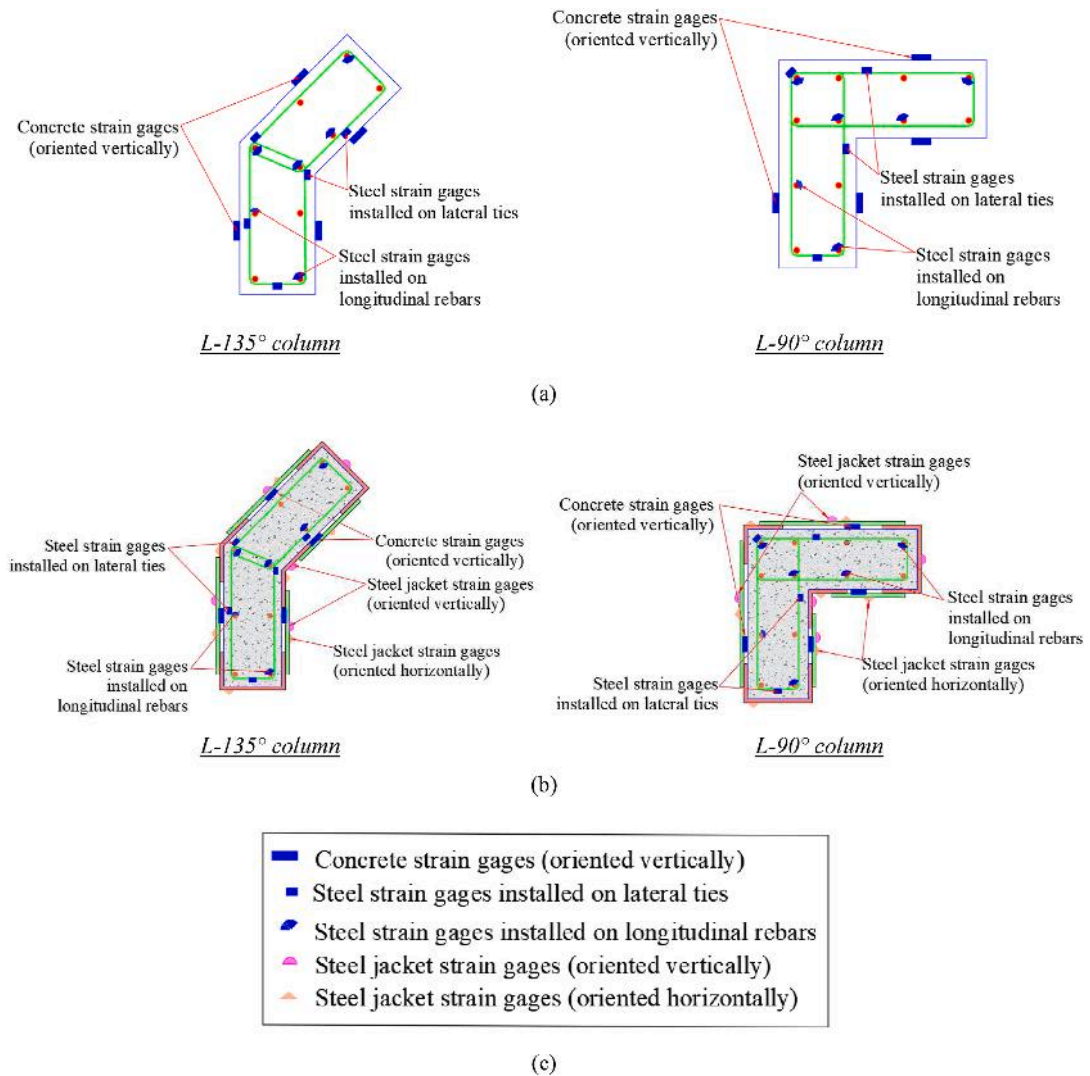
Layout of strain gages at the mid-height of test specimens: (a) Unstrengthened columns; (b) Steel-jacketed columns; (c) Legend.
